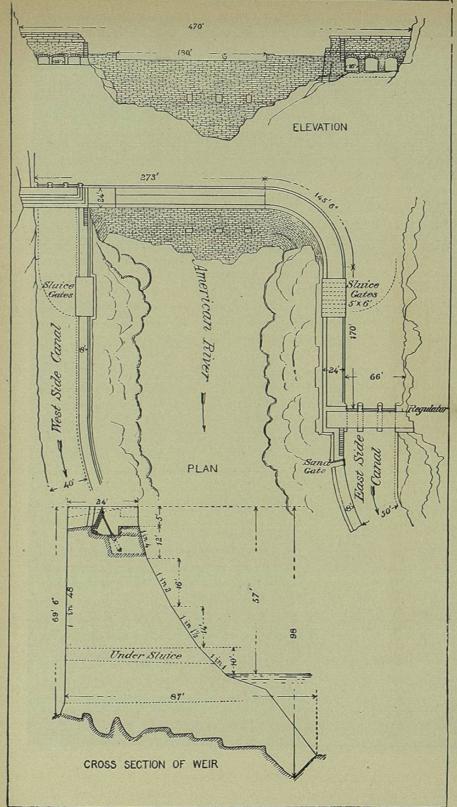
Plan, Cross-section, and Elevation of Weir and Headworks of Folsom Canal.
